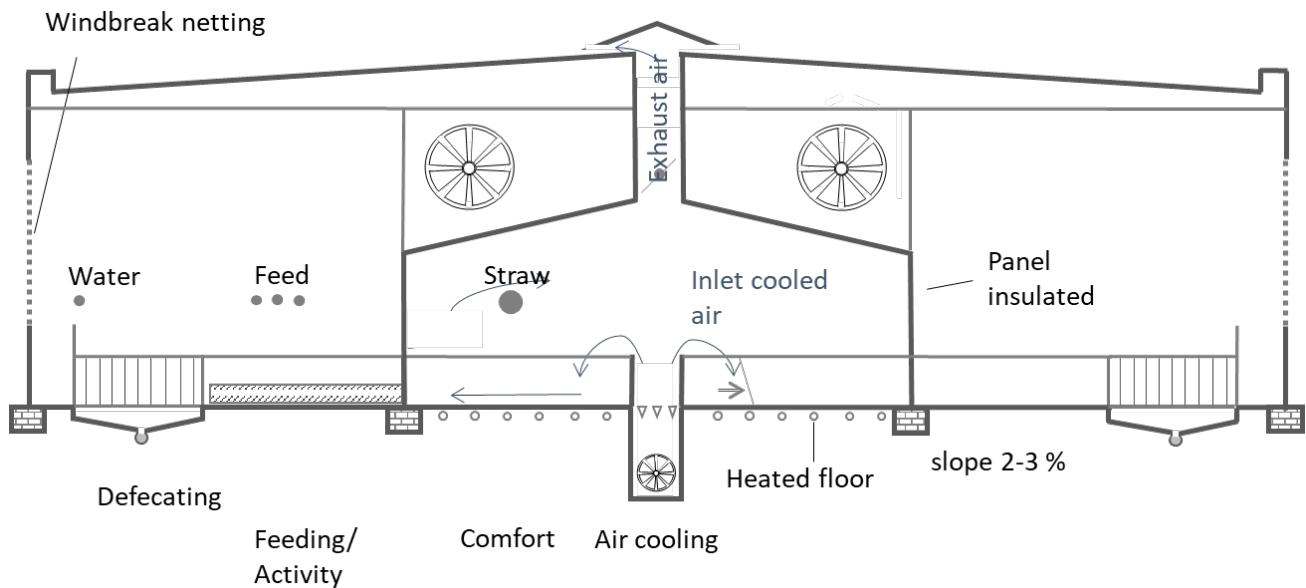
Finishing pig house with flat roof construction and encapsulated comfort zone
